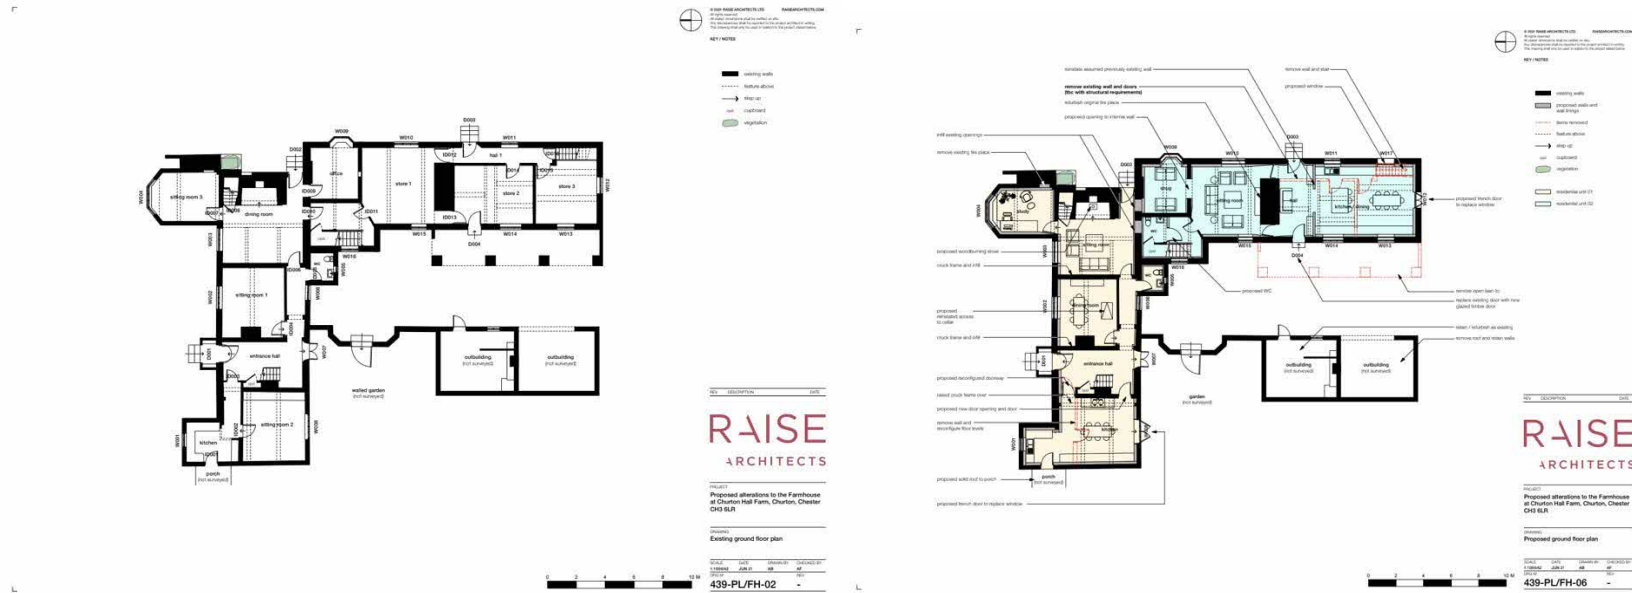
Ground floor plans – existing and proposed from left to right (Copyright: RAISE architects)
